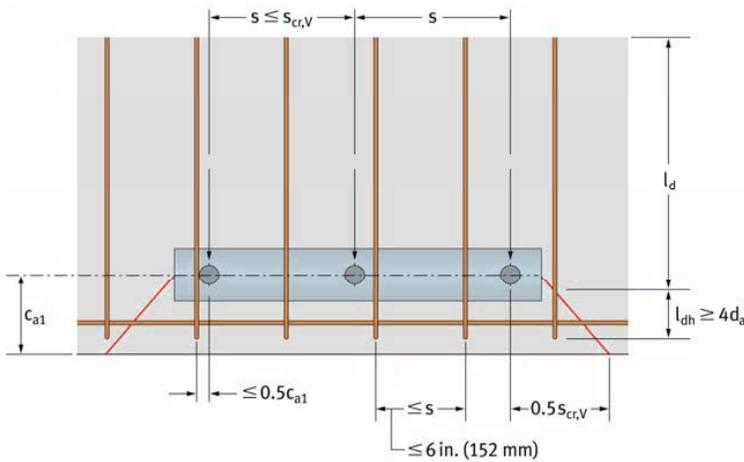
Requirements for detailing of anchor reinforcement of anchor channels
